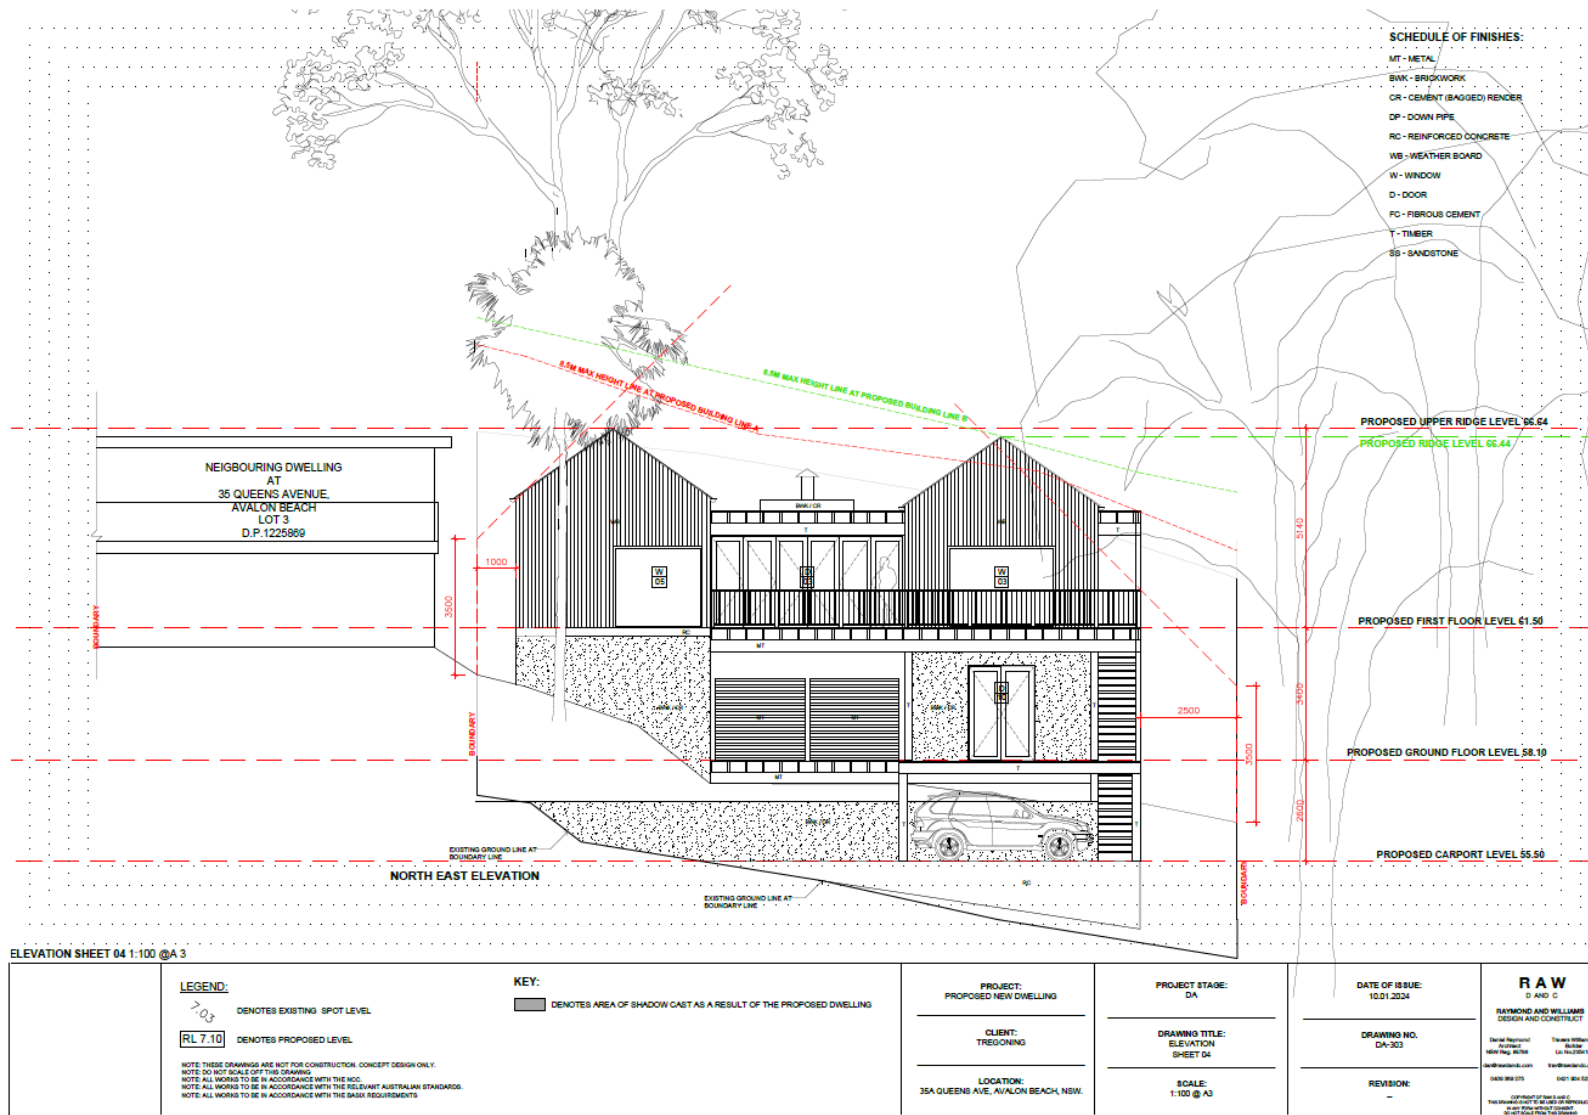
ILLUSTRATES PROPOSED NORTH EAST ELEVATION
